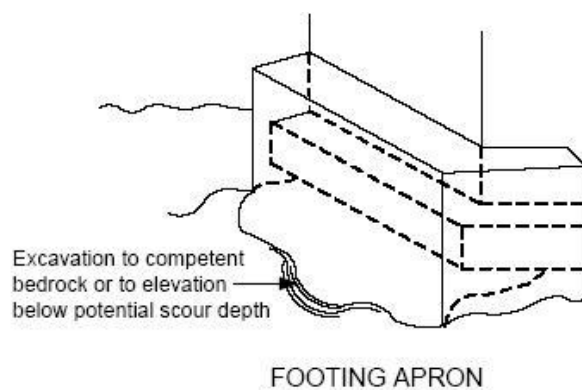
Concrete Footing Apron on a Masonry Arch Bridge
